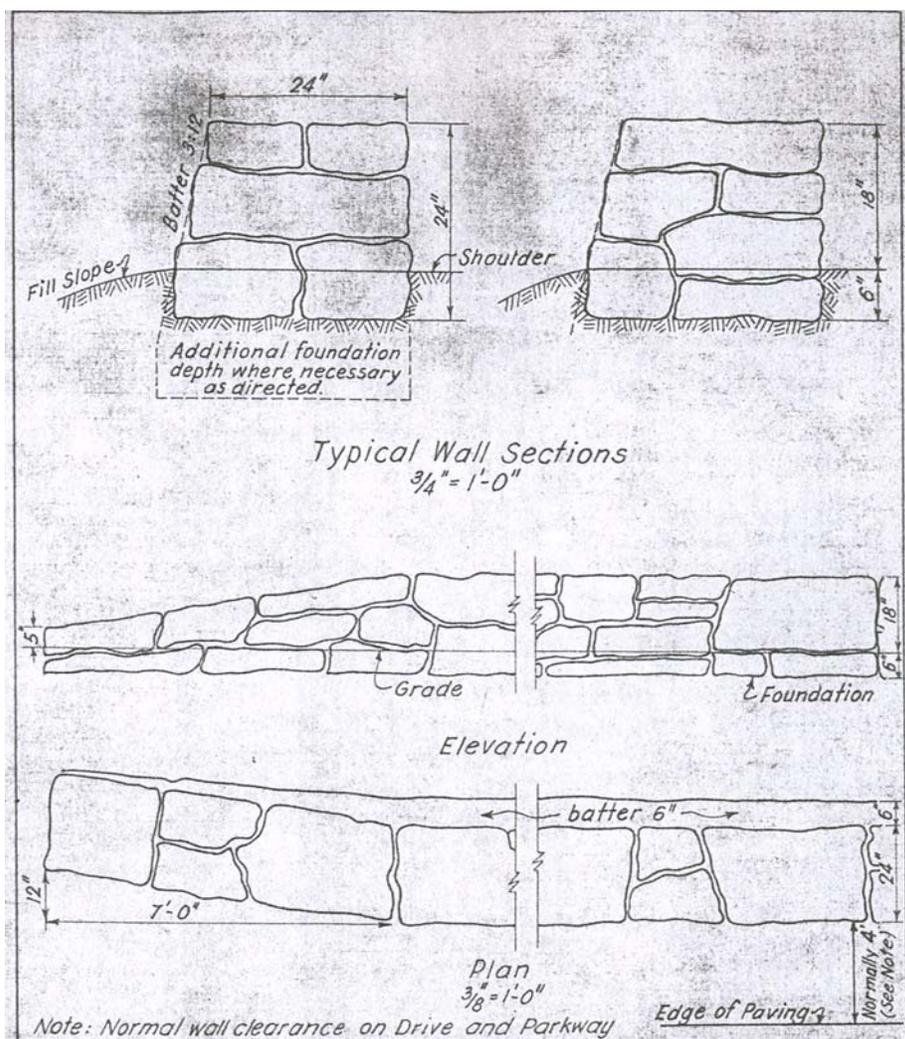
Typical guardwall section and elevation from construction documents, BLRI Archives, US Department of the Interior, National Park Service, *Proposal and Contract, Project 3B8-C4-D3, Shenandoah National Park and 1A3, Blue Ridge Parkway Guardwalls*, July 15, 1941, Plan Sheet 3 of 5.
